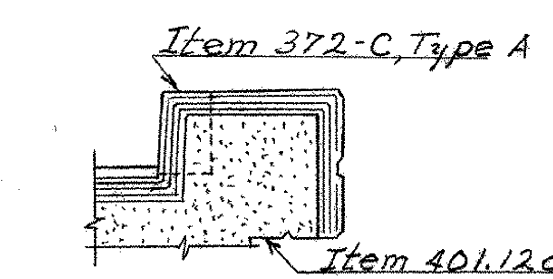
C - JOINT SEALER - PREFORMED - TYPE A
